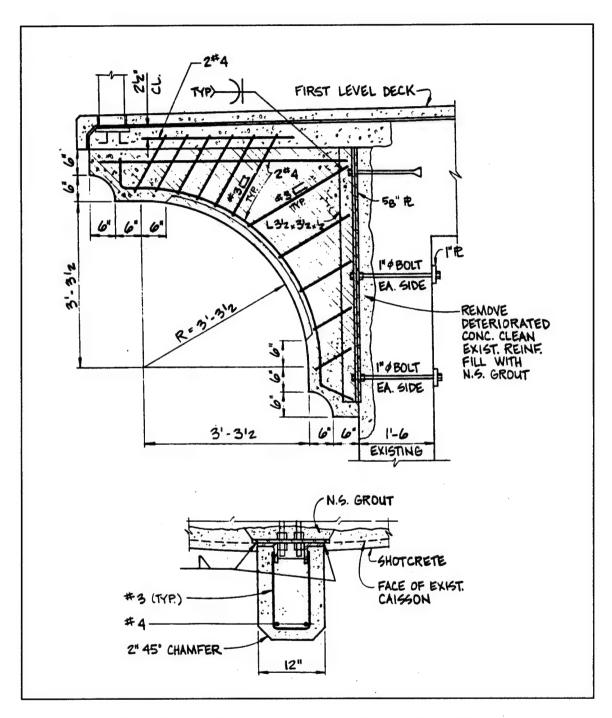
First-level precast concrete brackets, Brandywine Shoal Lighthouse (from Paul 1987)
